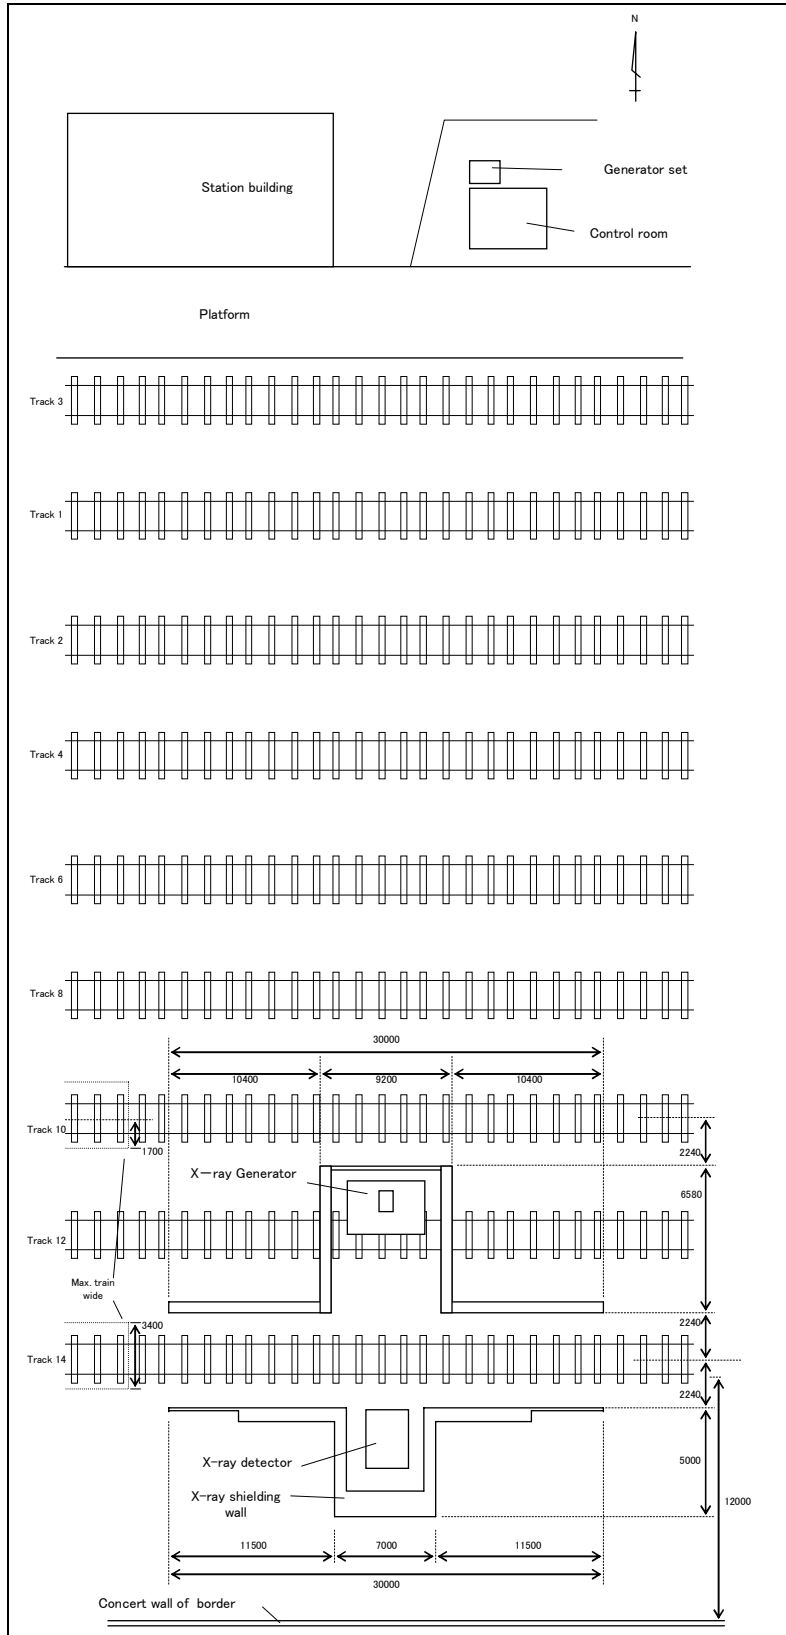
Galaba Railway Check Point – Conceptual Layout Plan
